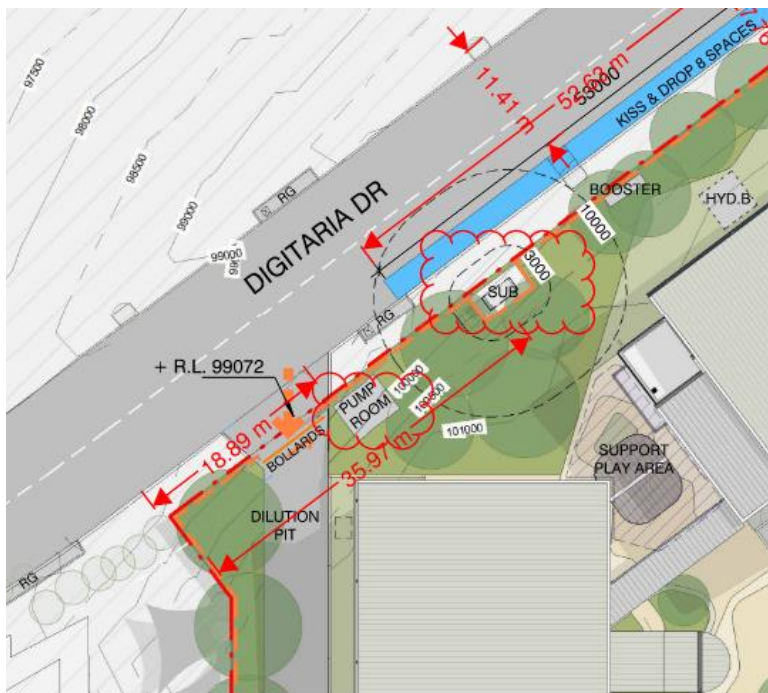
FIRE PLANT LOCATION / ELECTRICAL SUBSTATION LOCATION
